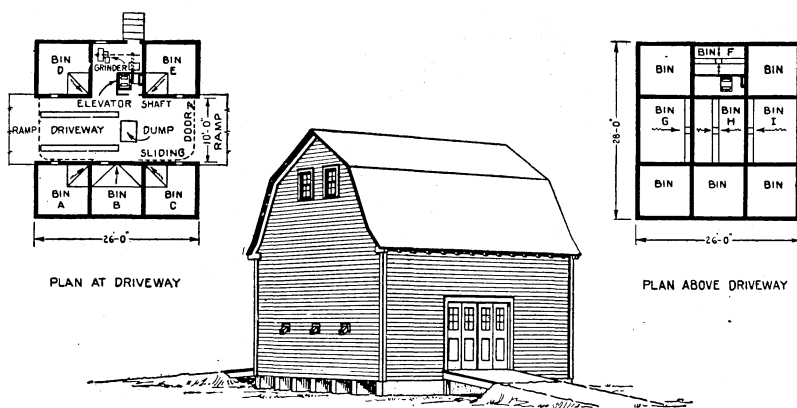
Type of farm grain elevator of balloon construction suitable for storing from 4,000 to 6,800 bushels. The storage contains four hoppers and five partly hoppers bins, central driveway with wagon dump, space for cleaning and grinding, and elevator. Estimated cost, exclusive of machinery, \$2,500 to \$4,000, according to capacity
